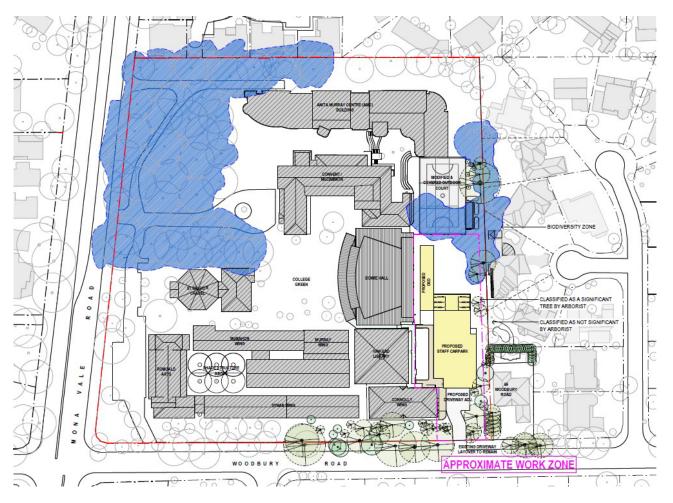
Proposed Site Plan Source: Mayoh Architects The proposal requires demolition on the site to facilitate the new carpark. Specifically, the demolition works proposed include the demolition of the existing gymnasium and the Sister Adrian Wing and the associated structures.
